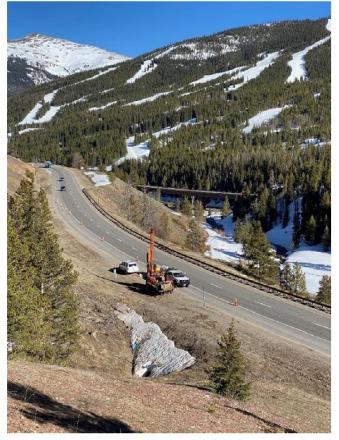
Area 1, Boring B-1 location near existing drainage. Eastbound I-70 bridge near Copper Mountain Ski Area shown in the background, looking southeast.
